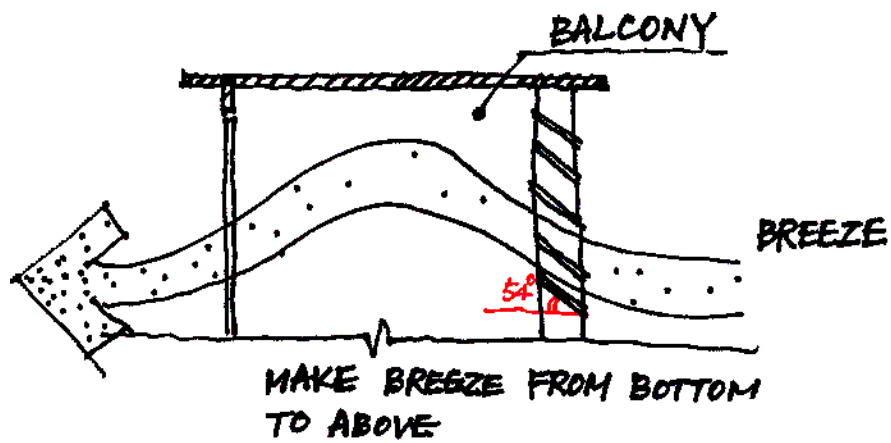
Window structures in plantations that direct breezes from lower to upper level of the balcony
